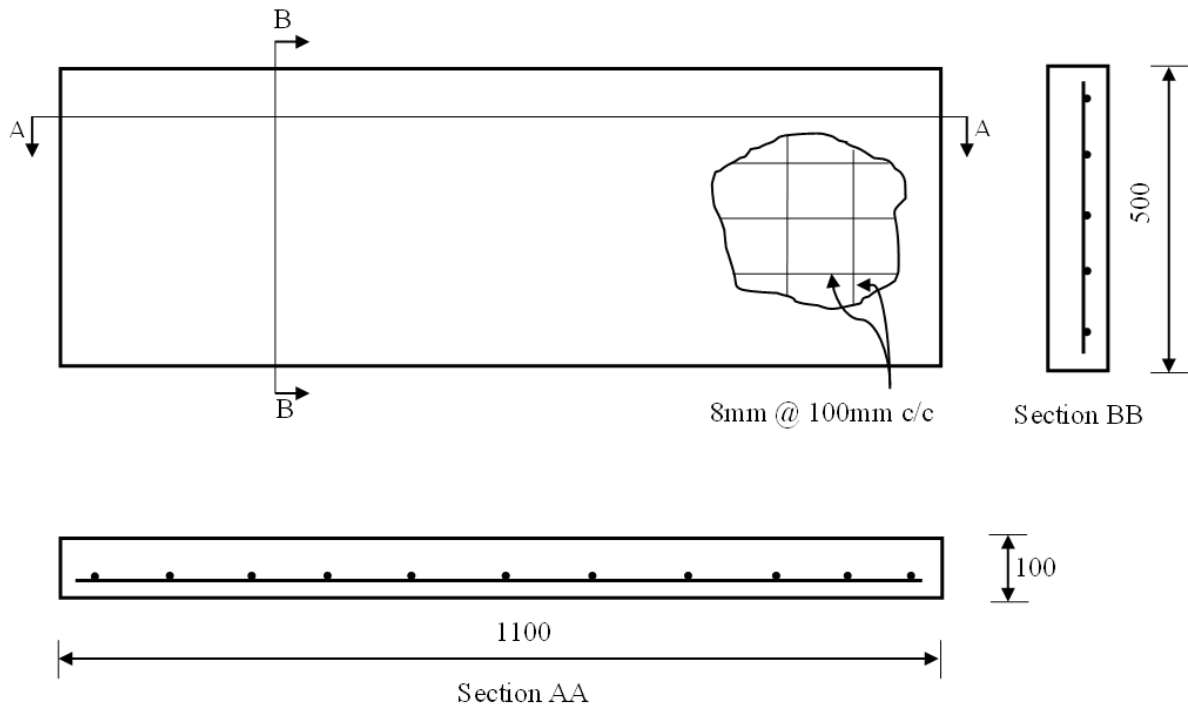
Details of solid concrete panel (All dimensions are in mm)
